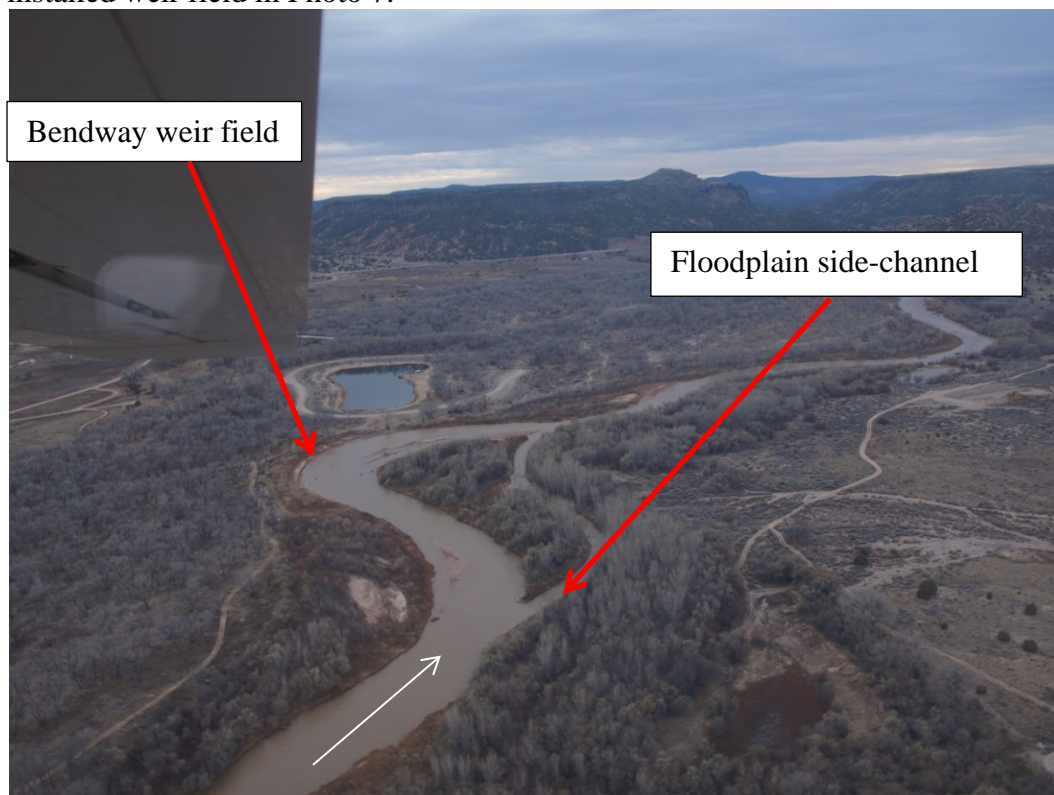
San Ildefonso Project Site Aerial View (AuBuchon, December 2015)
